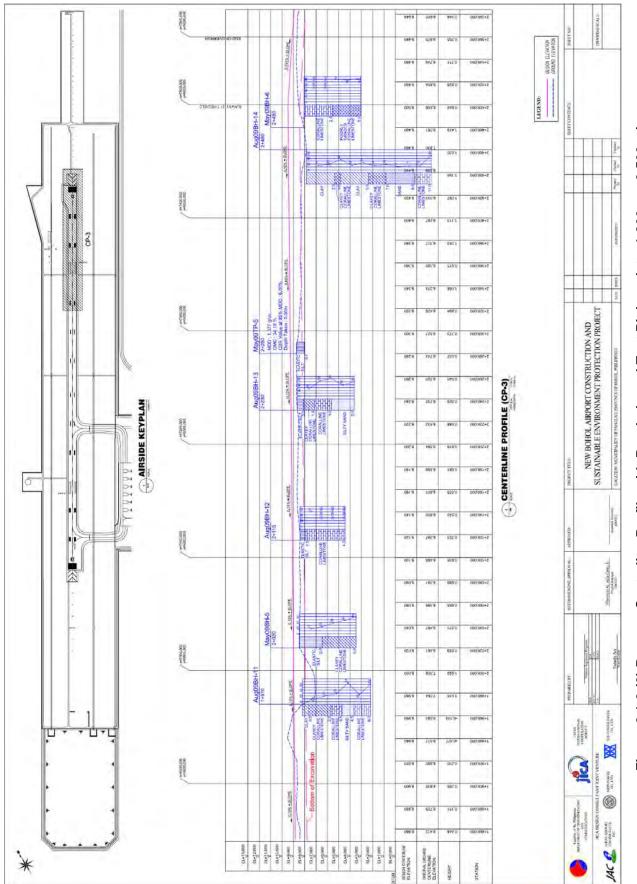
(3) Runway Centerline Profile with Borehole and Test Pit logs (sta. 1,860 m - 2,560 m)
